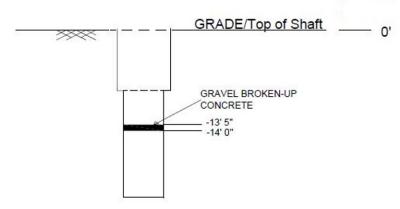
Illustration. As-built concrete coring of test shaft #2.
